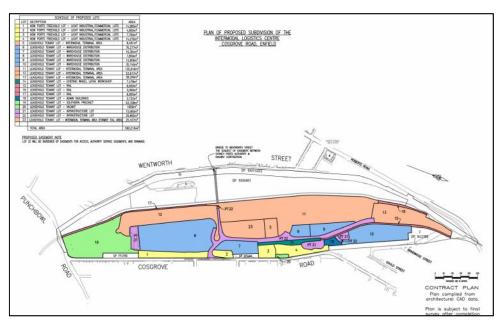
Enfield ILC plan of subdivision and site uses (Source: NSW Ports Modification No.8)
